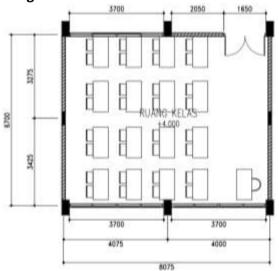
Floor Plan of Opening Dimension Changes (Source by Author, 2024)
